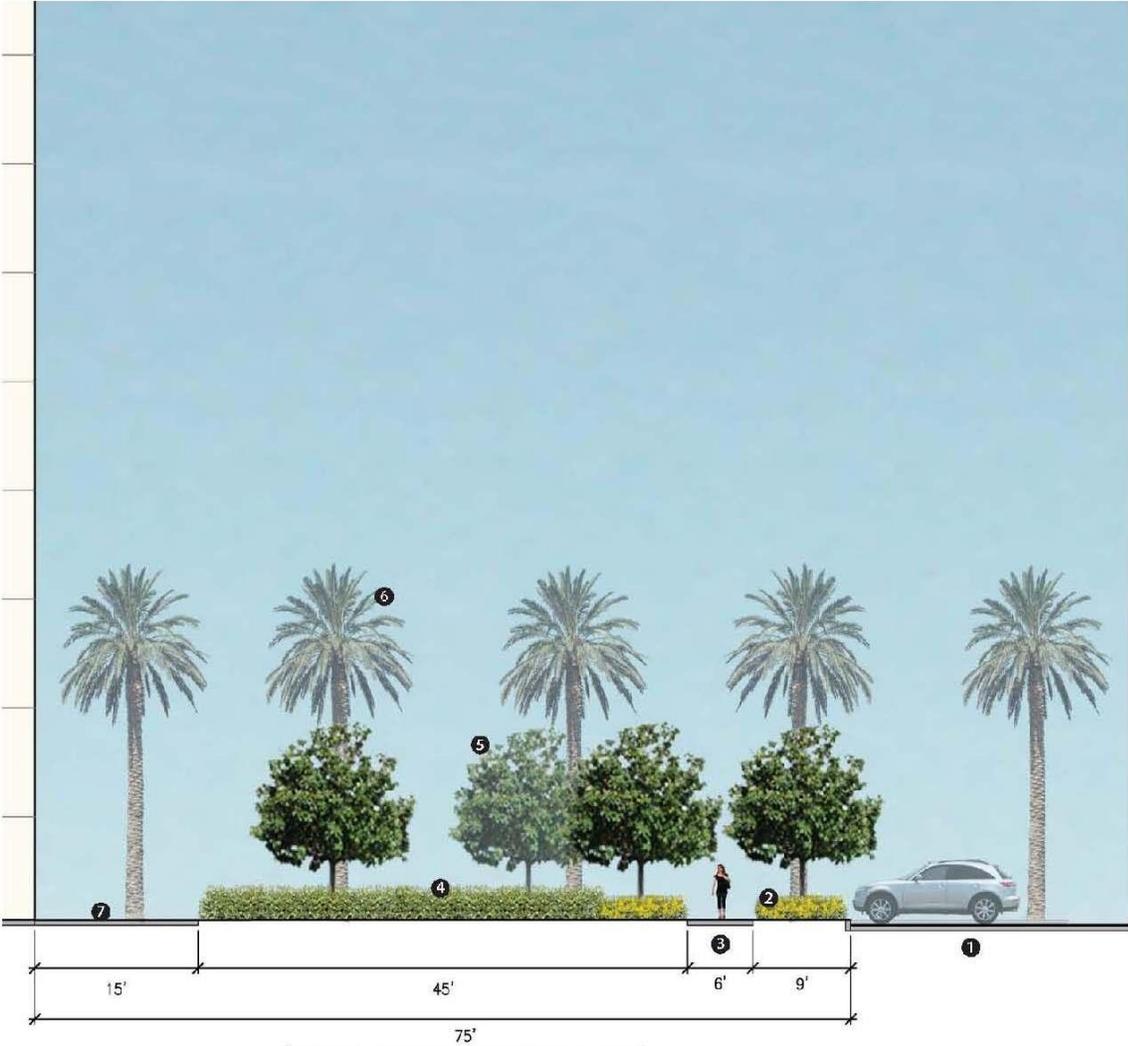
9-12 Story Office Building Front Facade
